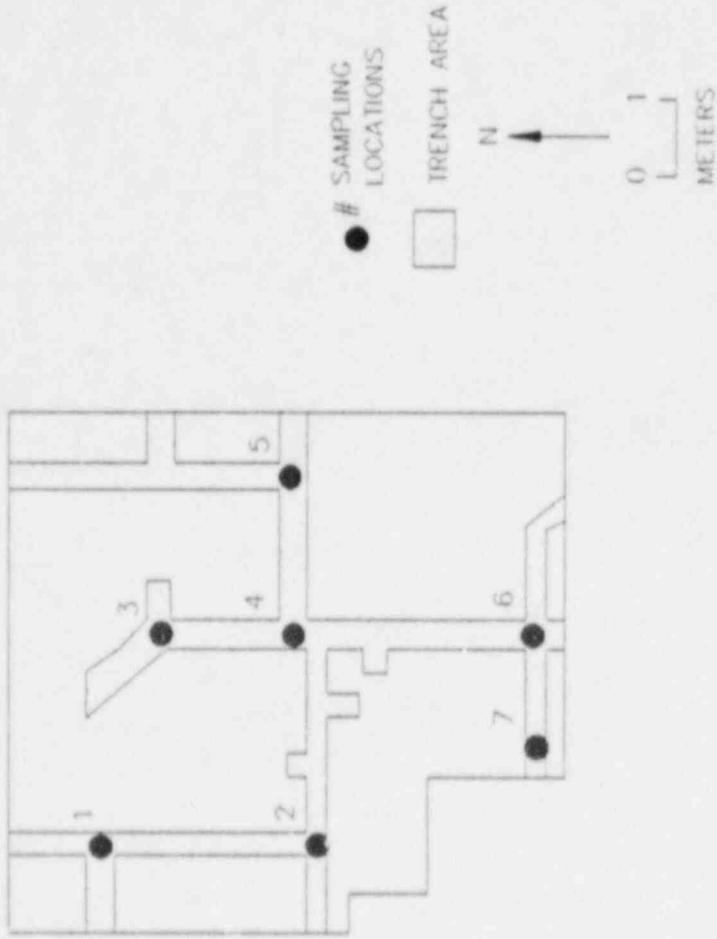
Room 20 Showing Trench Soil Sampling Locations
